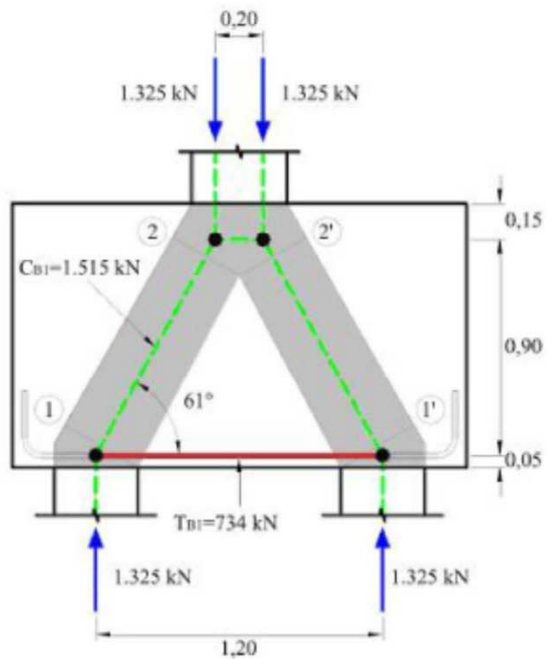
Model B1: compressive forces of concrete in column (dimensions in m)
